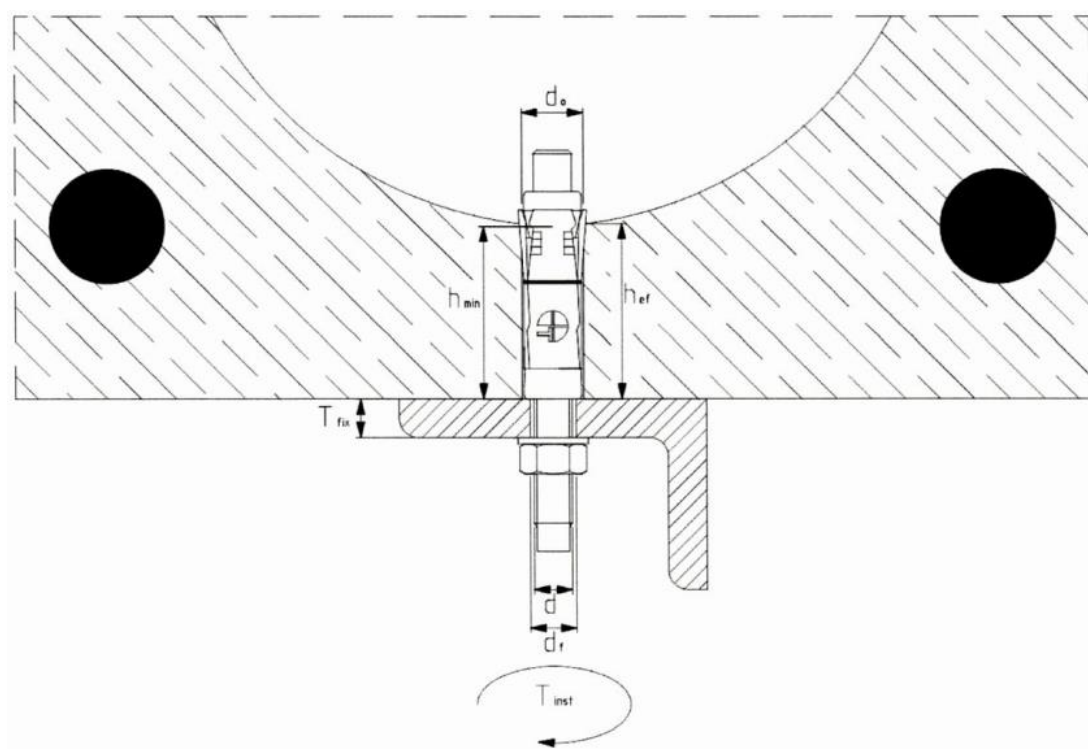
Installation parameters of TSA, TSA P, TSA L, TSAE and TSAH fasteners in a concrete hollow-core slab
